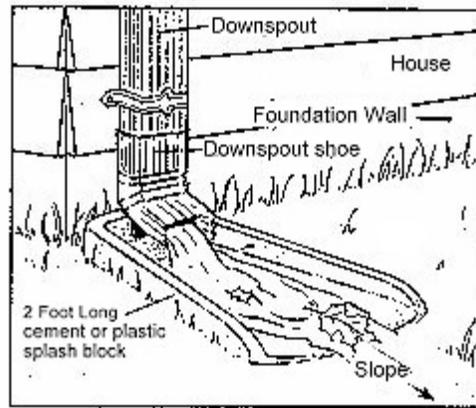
Correct installation of downspout shoe and splash block at foundation wall. Note that ground surface slopes away from house.
